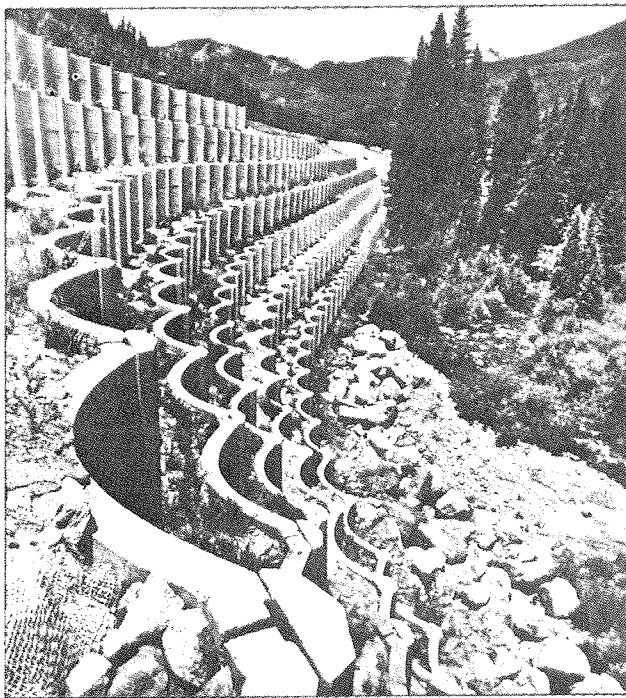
Vail Pass tiered Reinforced Earth wall. (Source: Ref. 1)
